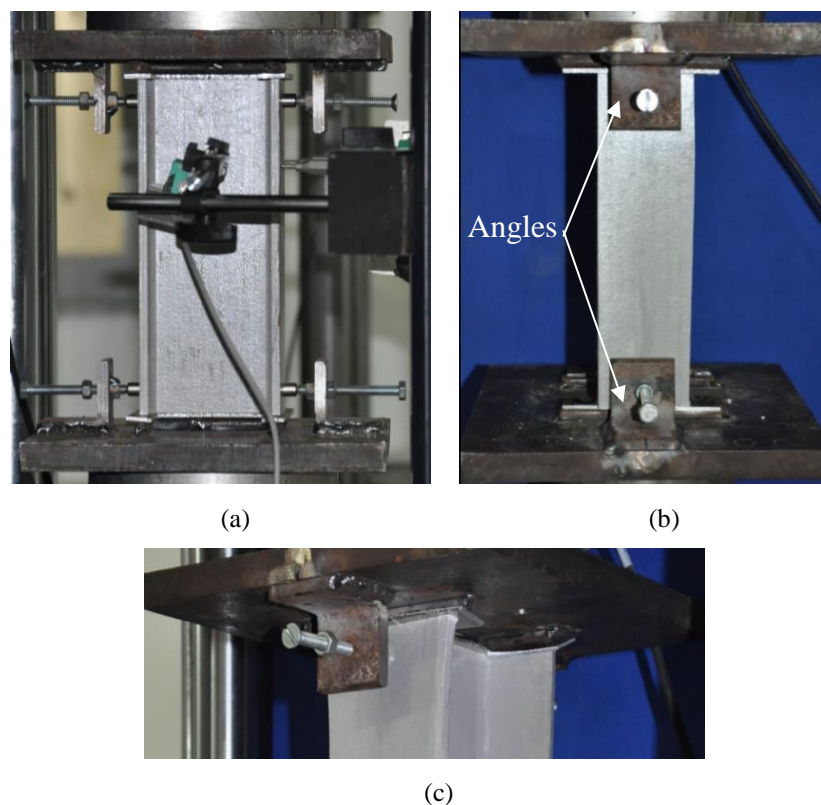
Final set-up for simply supported plates: (a) Lateral view; (b) Frontal view; (c) Overview
